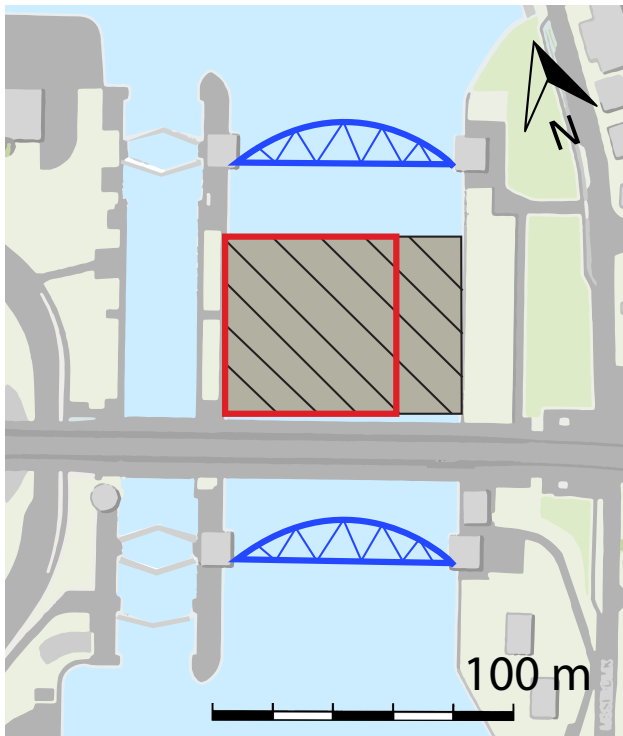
Step 2: Install sheetpiles culvert structure. Sheetpiling is depicted in red.
